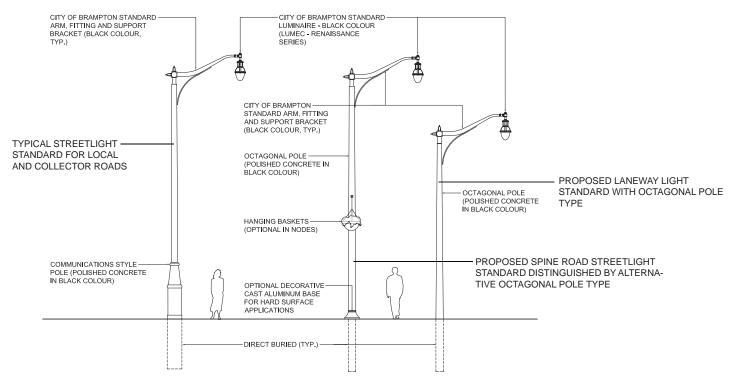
Consistent with Block Plan 51-1, street light standards proposed for all roads within Block Plan 51-2 except the Spine Road will reflect the City of Brampton standard with communications style pole and Lumec Renaissance series luminaire (in black). Light standards along the Spine Road will integrate a unique, simple octagonal pole with similar luminaire to help distinguish the road as the character avenue for the community. An optional decorative cast aluminum base is specified for hard surface applications (within paved surfaces). Light standards within laneways will similarly integrate the octagonal pole option. All proposed street light standards are subject to approval by the City of Brampton, Works & Transportation.
